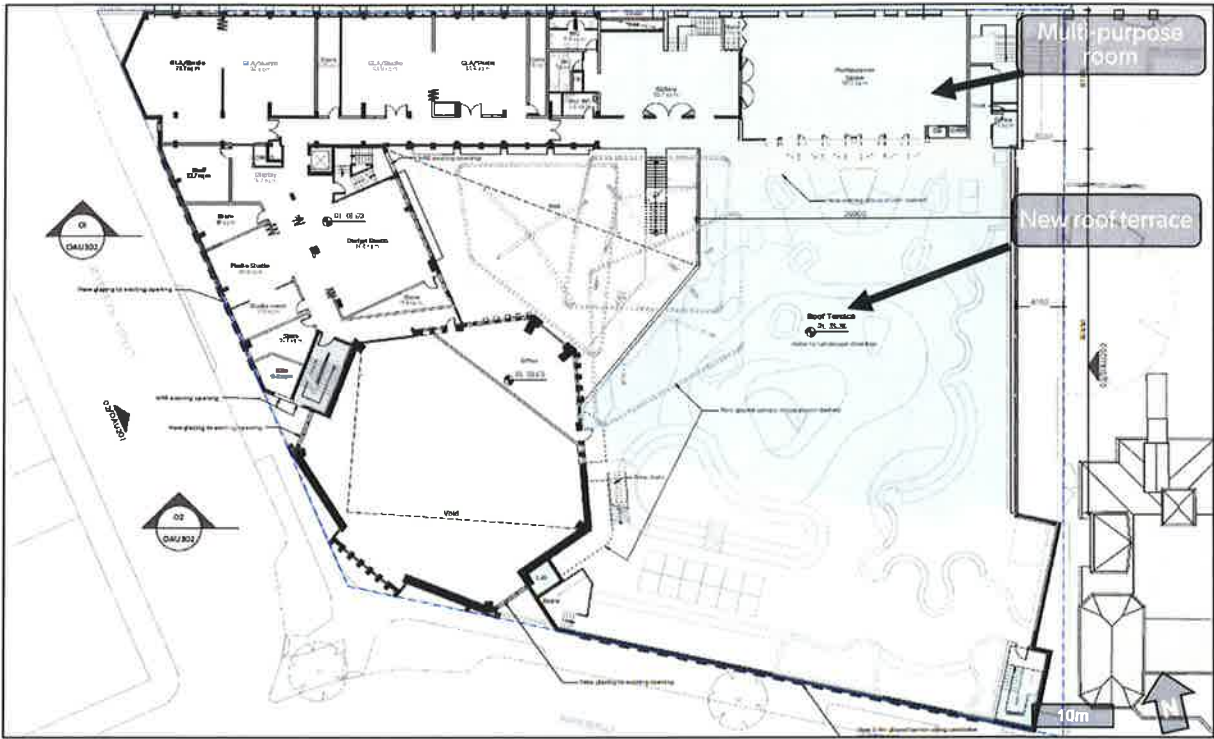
| Main Campus – Proposed Level 3 (Roof Terrace) Layout (Source: Applicant’s EIS 2018)
